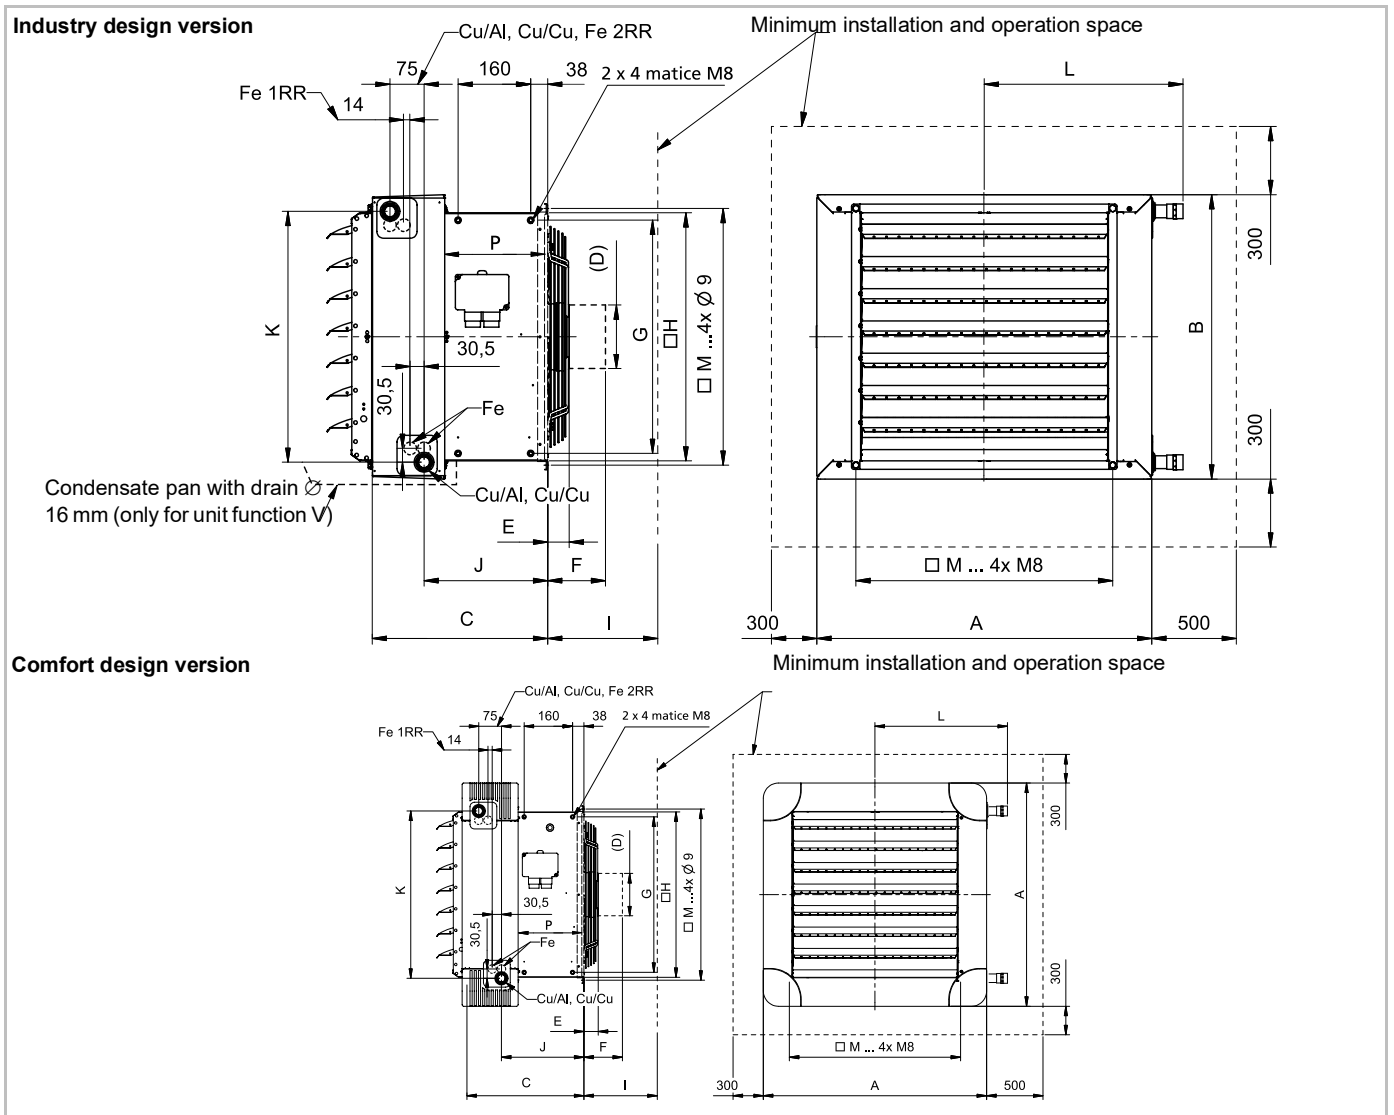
Heating (cooling) unit dimensions and heat exchanger connection
